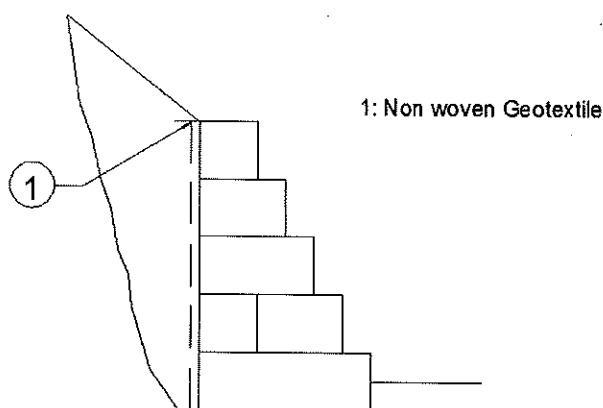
Use of Non-Woven Geotextile in Gabion Retaining Wall as Filter Media for Drainage
